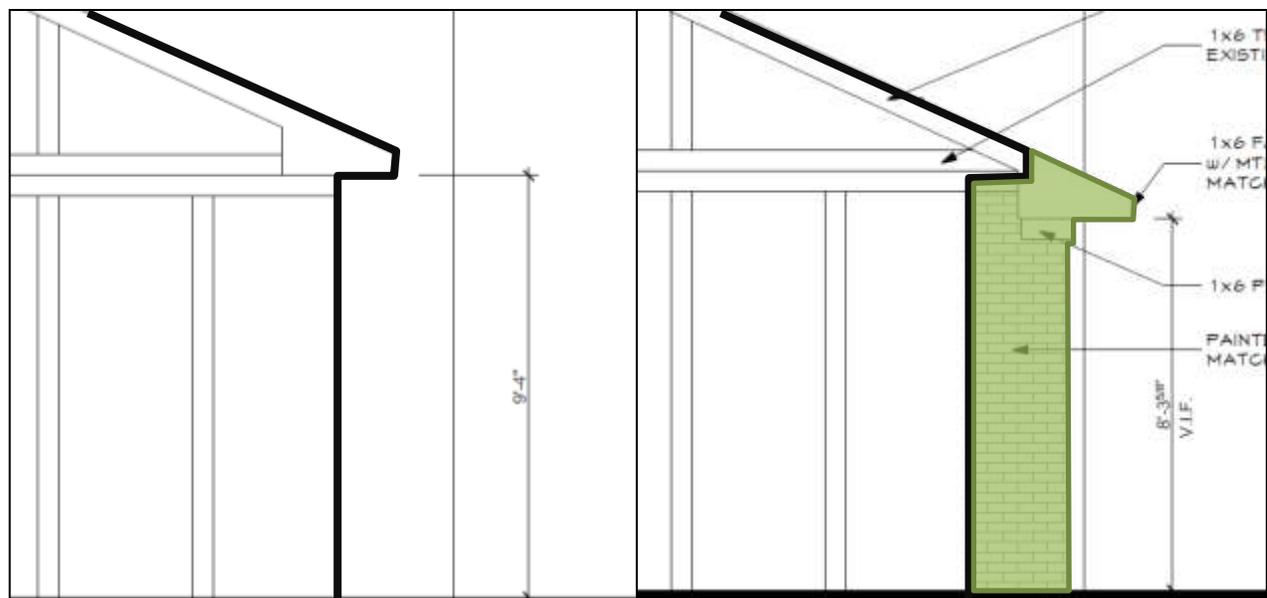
The proposed garage, shown in green, would extend 2.33 feet beyond the existing garage façade toward East Boulevard Drive (Source: Dvorak Drafting Consultants, LLC 12/10/2014)
